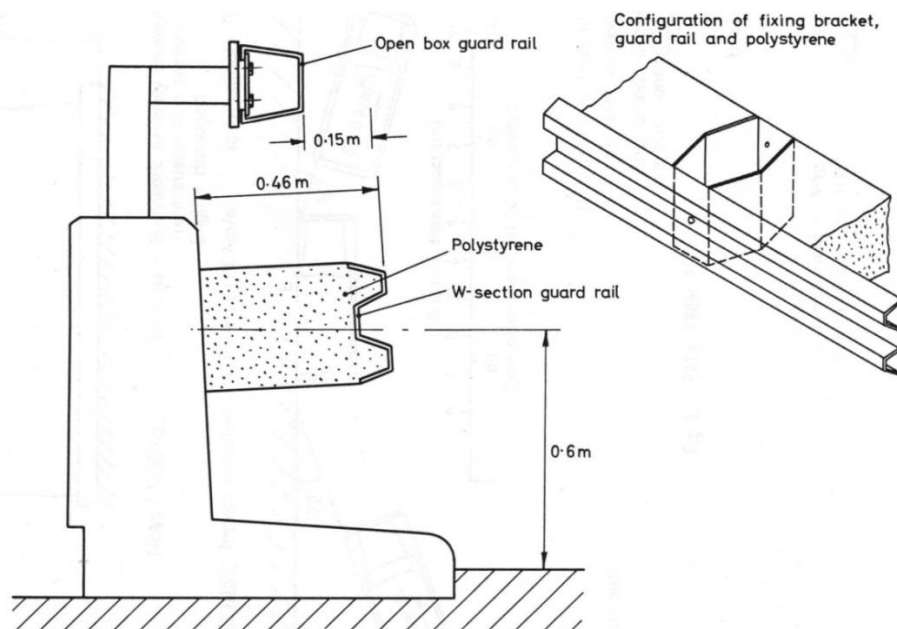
CROSS SECTION OF CONCRETE PARAPET FITTED WITH W-SECTION GUARDRAIL AND POLYSTYRENE PADDING
